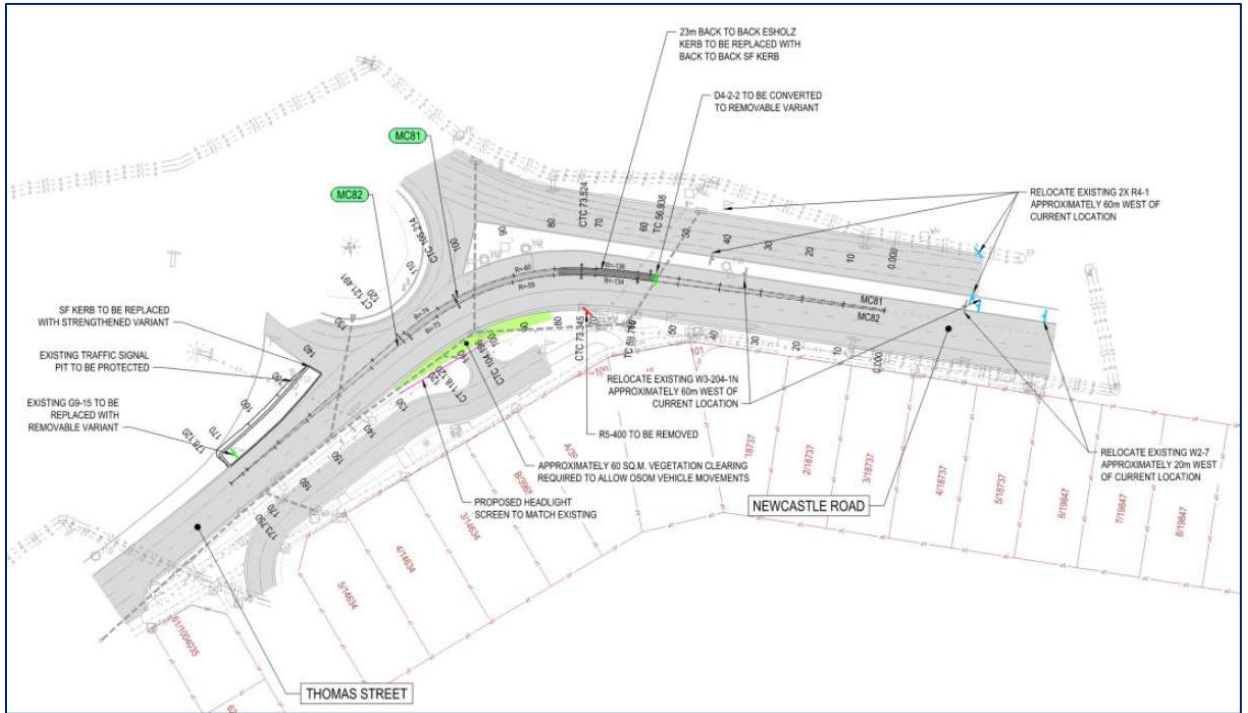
Site 8 proposed works at roundabout at intersection of Newcastle Road and Thomas Street
